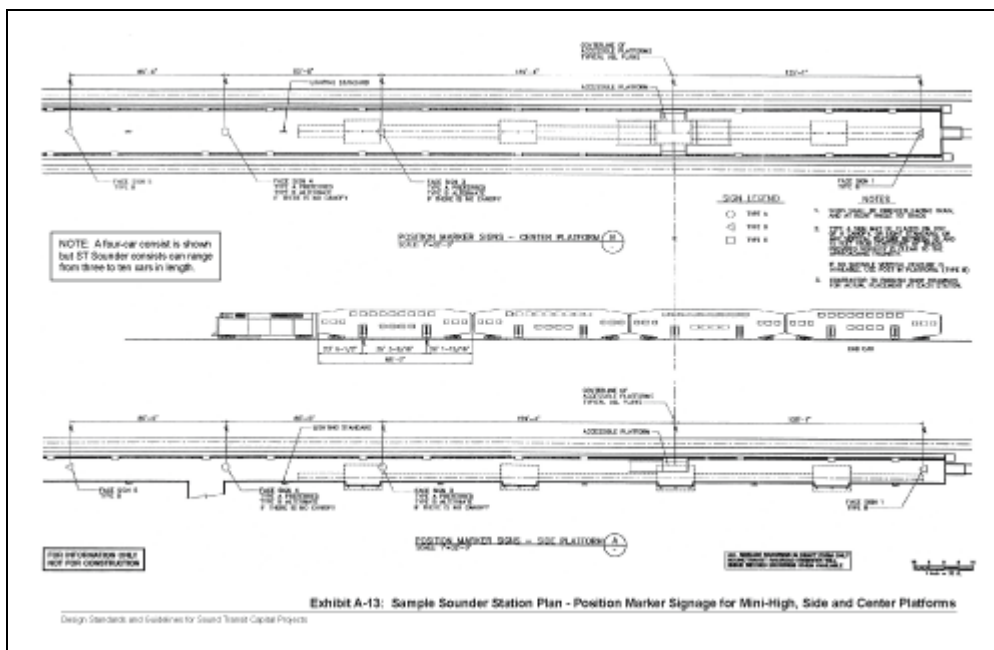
Sample Sounder Station Plan – Position Marker Signage for Mini-High, Side and Center Platforms (1.1 MB)
